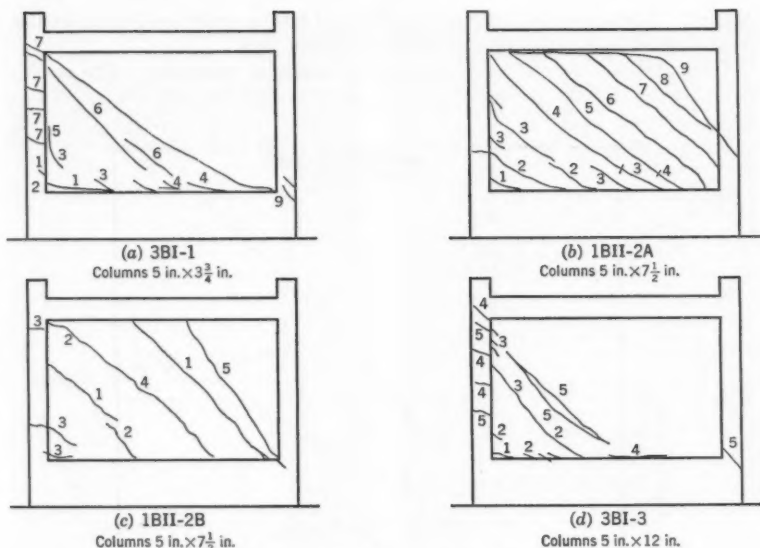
CRACK PATTERNS FOR SPECIMENS WITH VARIED COLUMN SIZE
